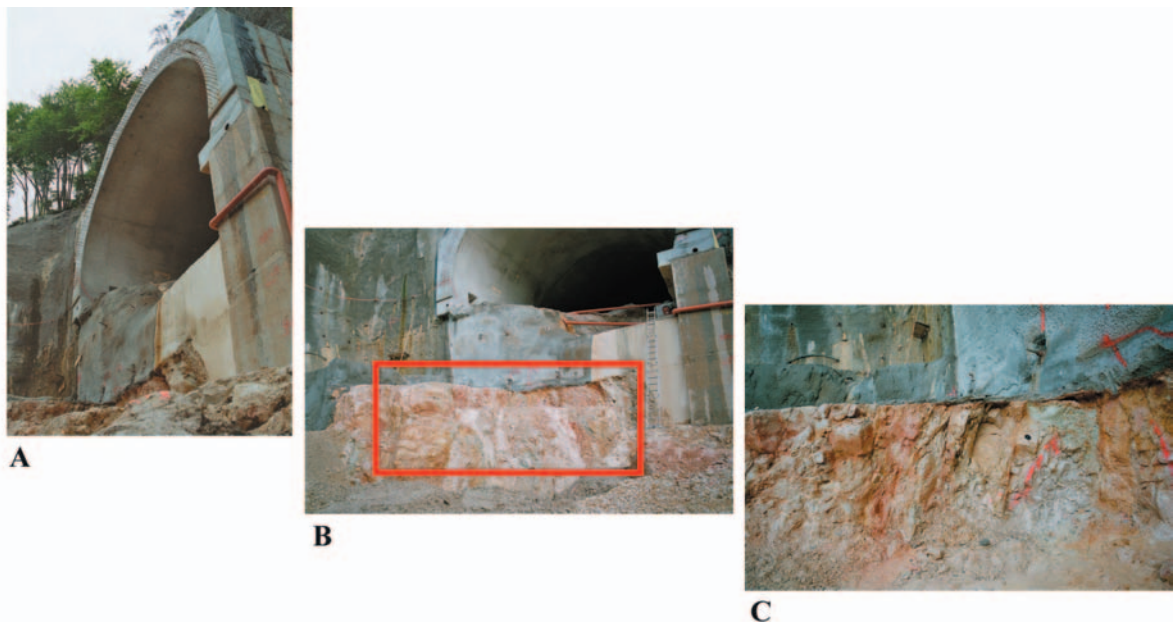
Roche St Jean tunnelling site under construction in spring 2005. A) View of the N-portal from where the Verrerie viaduct above the Choindez basin is under construction, to connect the Roche St Jean with the La Verrerie tunnel. B) Area where drilling operations have been performed. C) Outcrop conditions and damaged rock mass.
